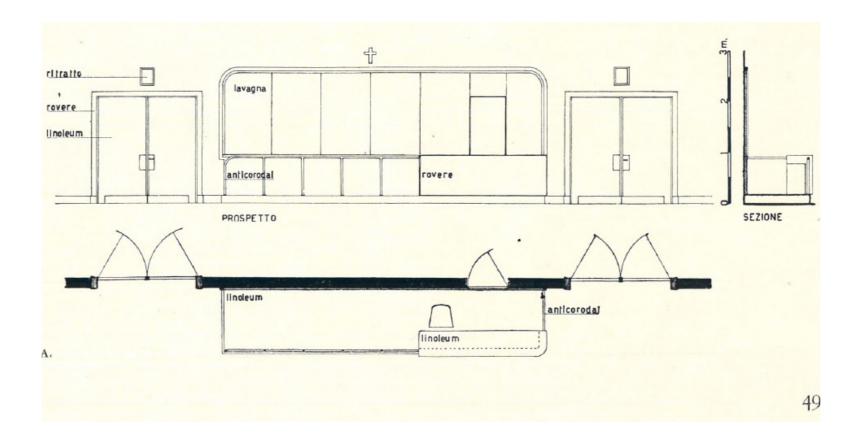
The 'wall system' including footboard / blackboard / desk / railing and wooden wall veneering, with the door opening leading to the changing room; plan, elevation, section (BBL drw 10)
